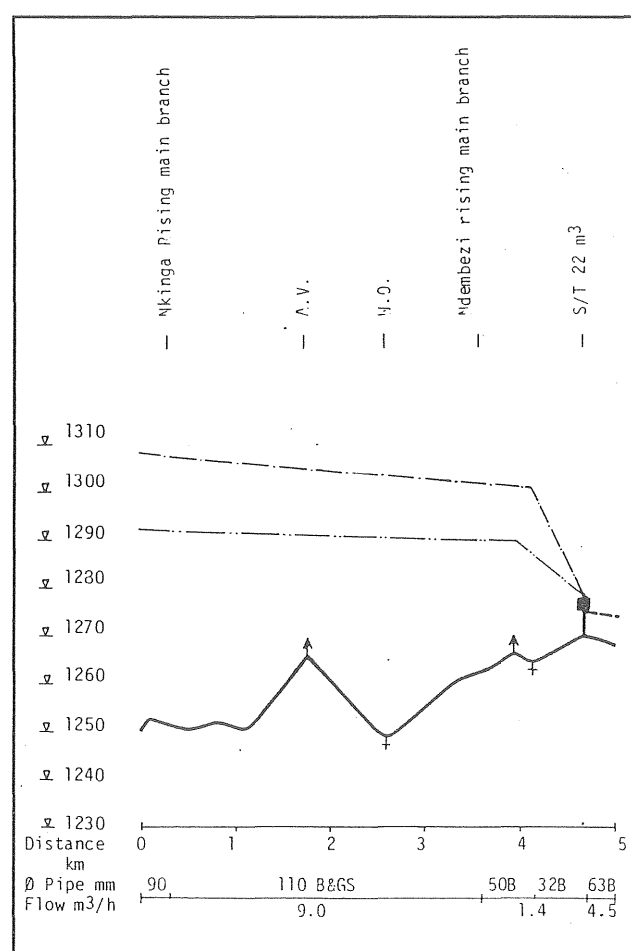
Longitudinal section of the pipe to the Ulaya Water Tower.
